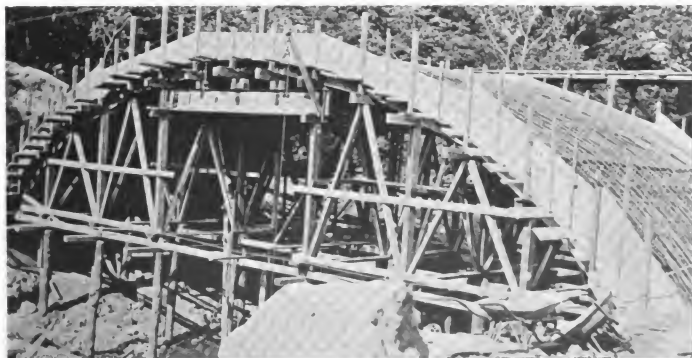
THE CLEVELAND AVE. BRIDGE, KANSAS CITY, DURING CONSTRUCTION. Note the structural steel girder carrying the center of the span, to allow for flood.
